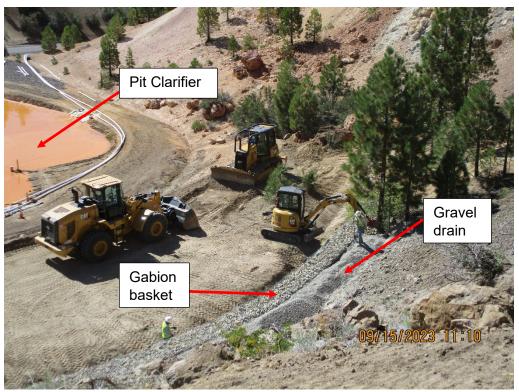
September 15, 2023, Installation of a gravel drain behind the gabion baskets at the Pit Slump.
